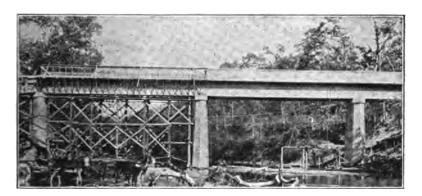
DECK GIRDER BRIDGE. ILLINOIS HIGHWAY COMMISSION.
